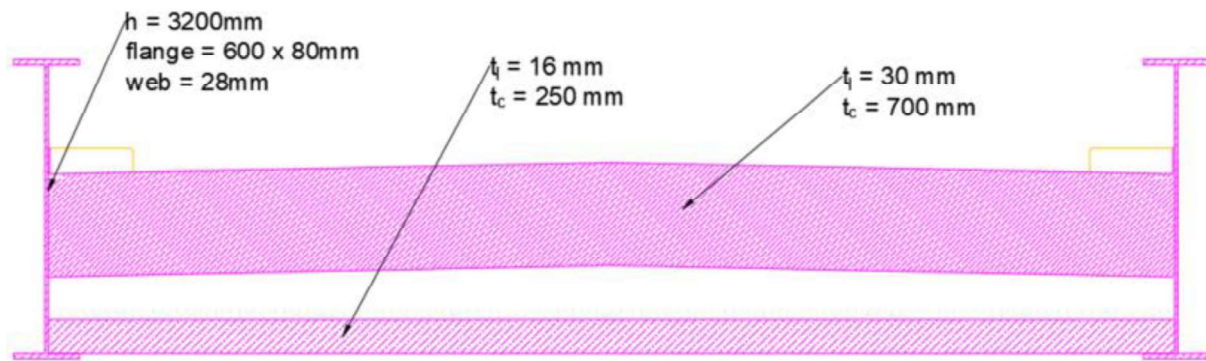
, Cross section MS variant 3, FRP main beam and deck, without crossbeam.
